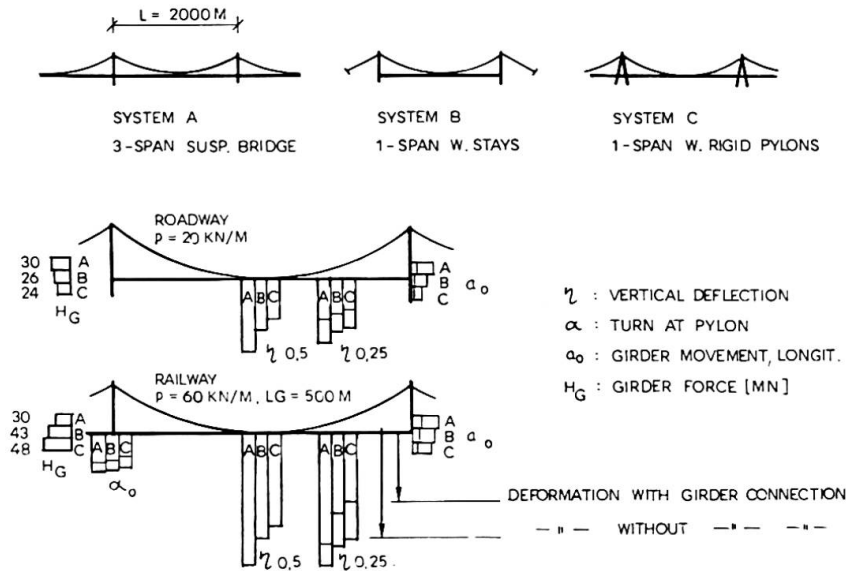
Effect of cable fixation at midspan by use of the bridge girder.
